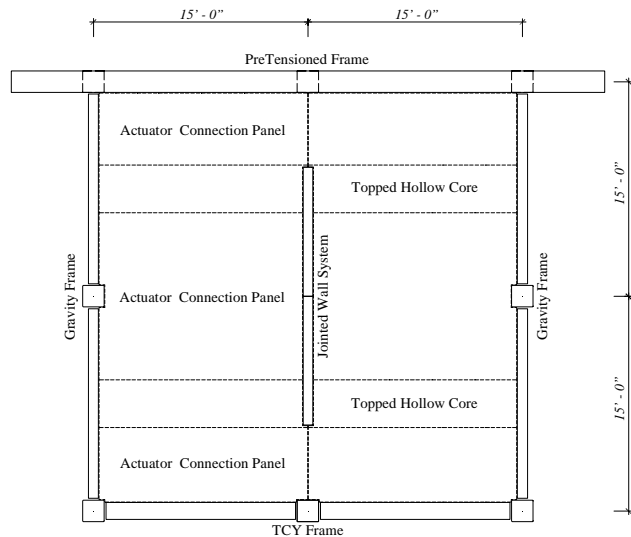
Floor plan of the test building at Levels 4 & 5.
